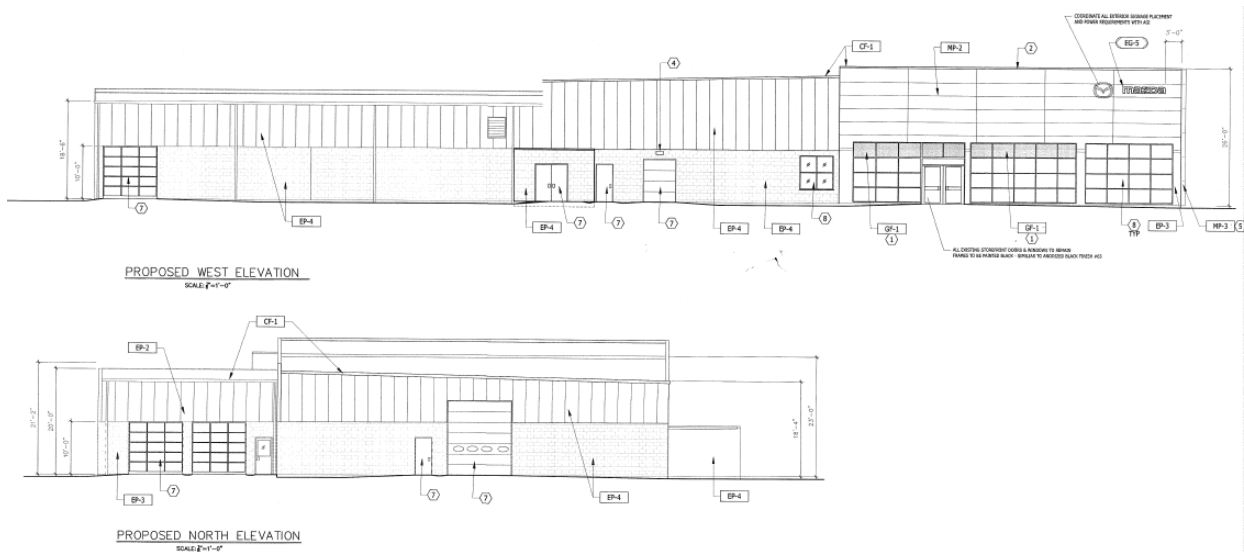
West/North Façade Elevations – PDS Engineering 2021
